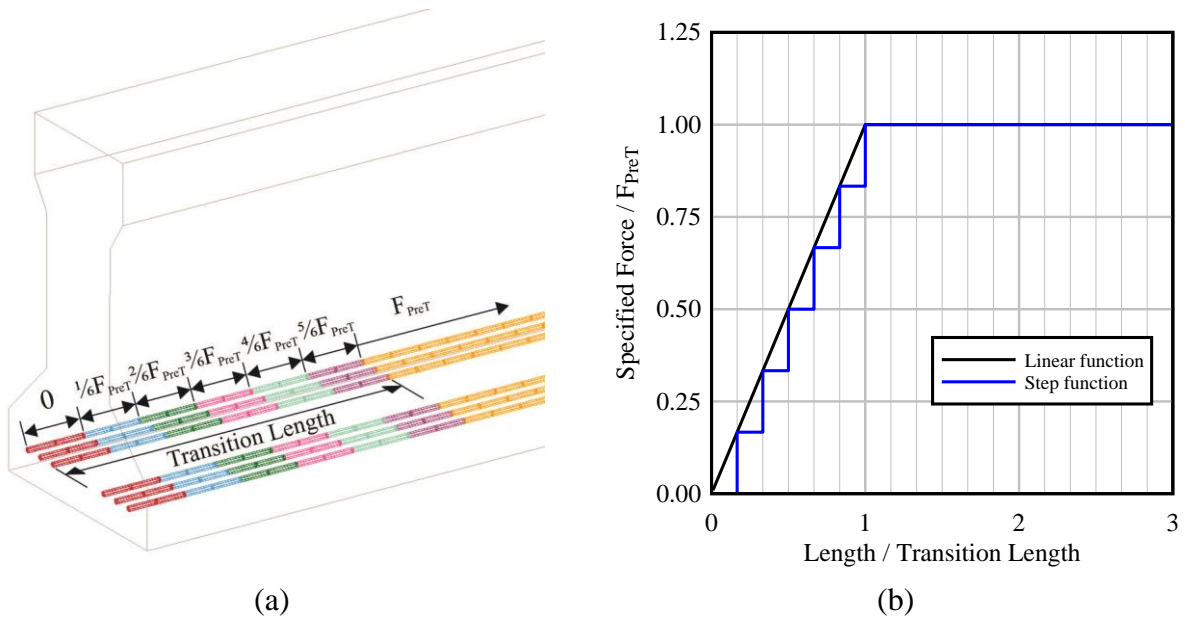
Specified prestressing force for pretensioned strand elements within transition length: (a) pretensioned strands modeled in an AASHTO beam section using discrete beam elements with different specified target prestressing force (using step function); (b) plot showing linear and step functions for force in pretensioned strands
